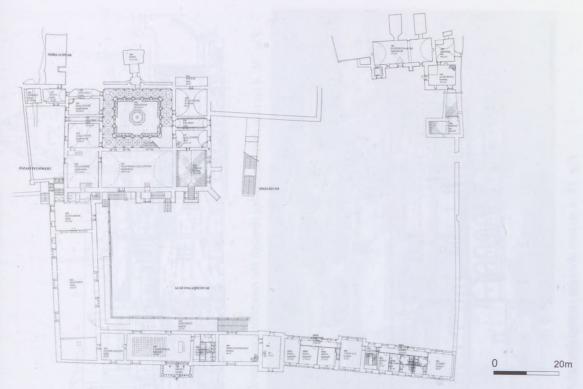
The ground plan of the ornamental courtyard's level in the reconstruction program plan
